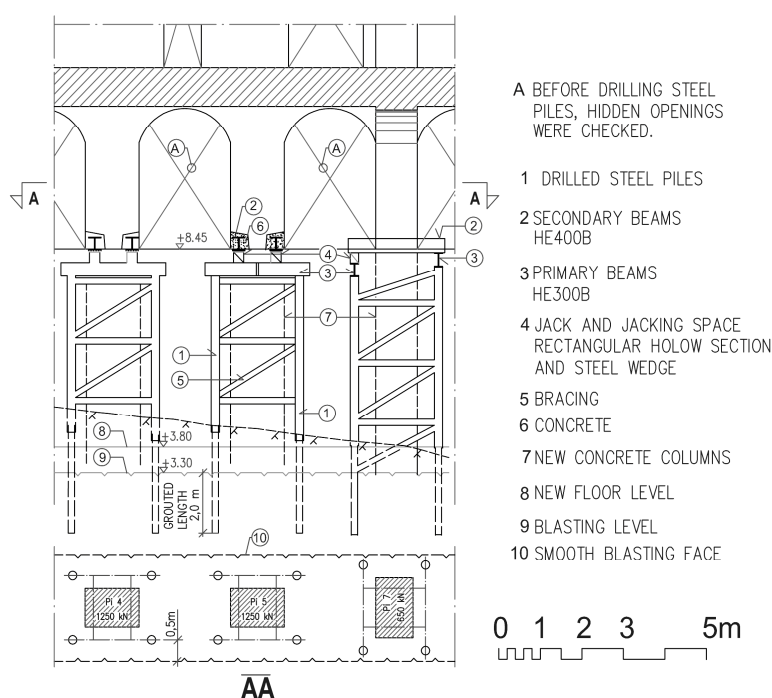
Middle wall, Drilled steel piles, Steel beams and jacking system, Bracing
